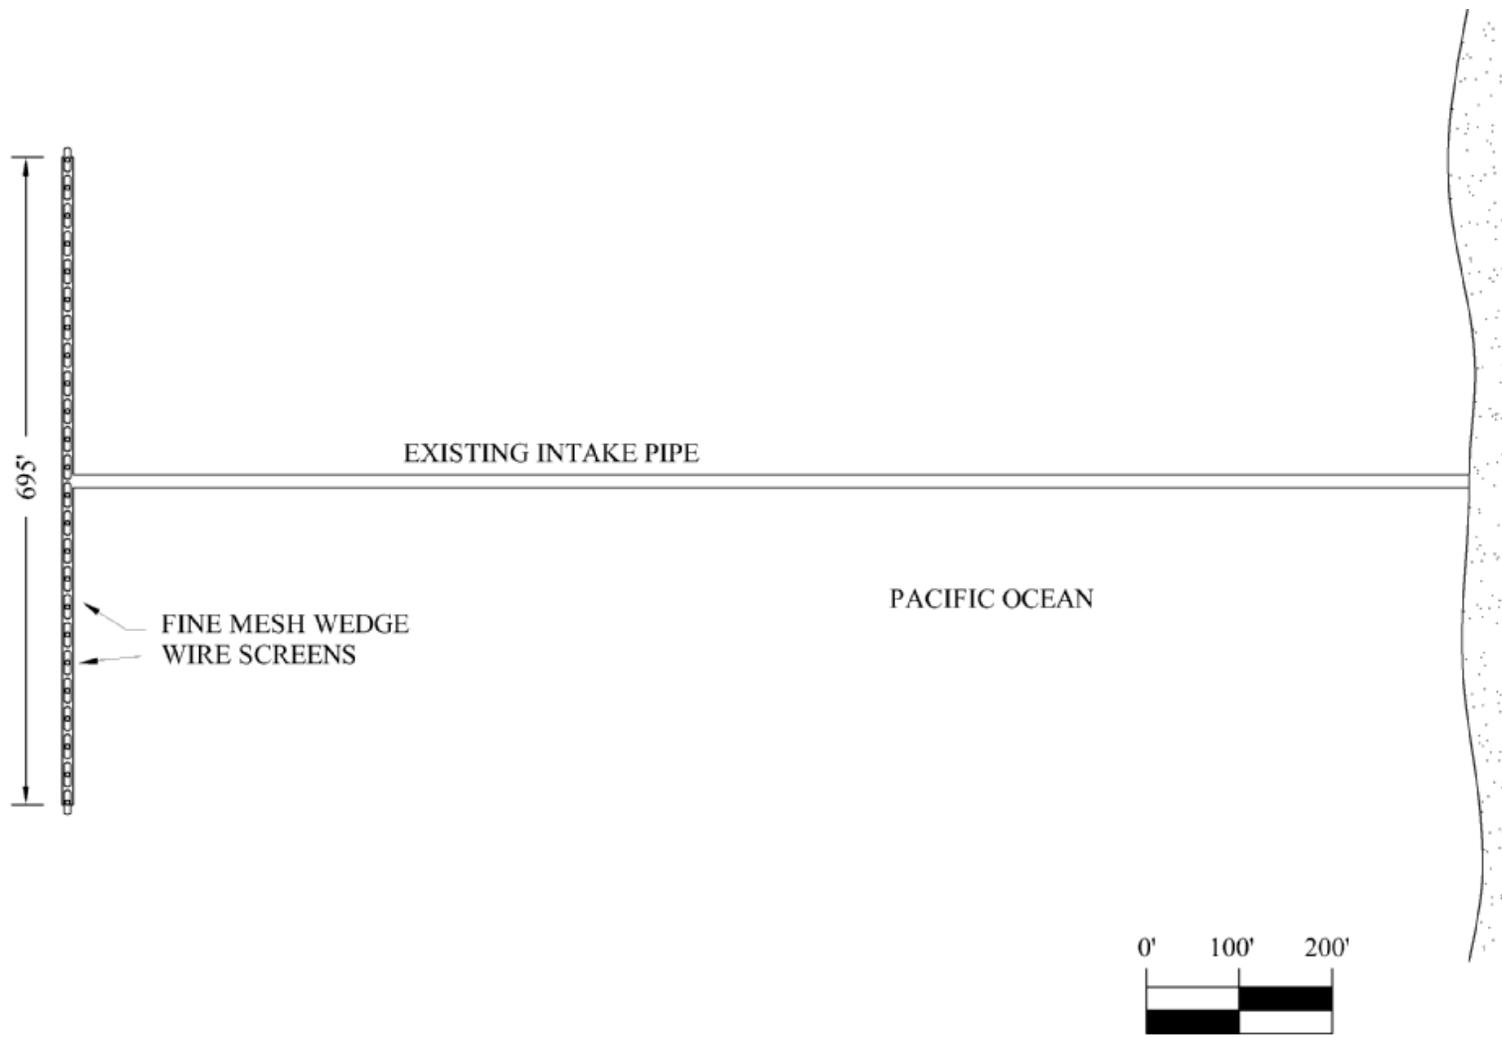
Cylindrical Wedgewire Screen, 0.5 mm Slot Width — Plan
